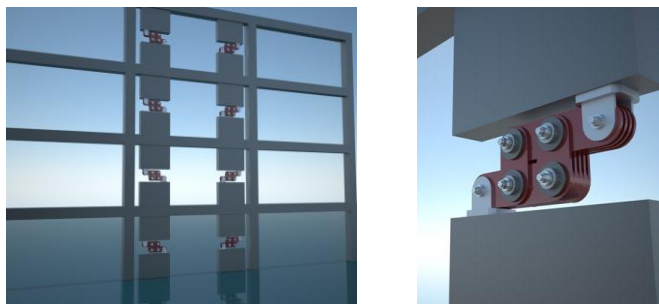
Left: Panel dampers installed in frame structure. Right: A single panel damper
